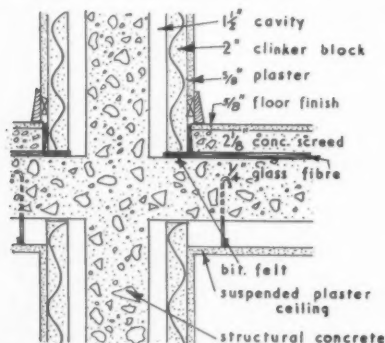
Detail showing disassociated linings used in part of the block with concrete box frame.
